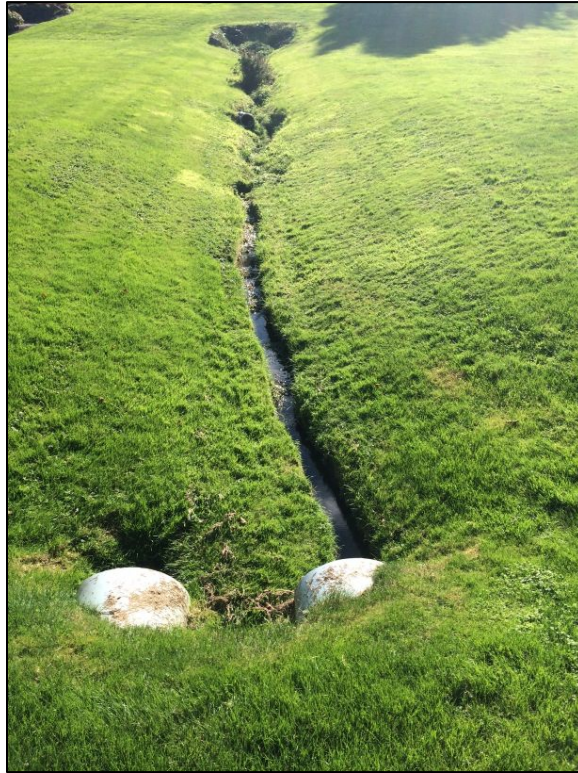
Drainage A facing south (upstream). Note small size (less than one foot) (10/2016)
